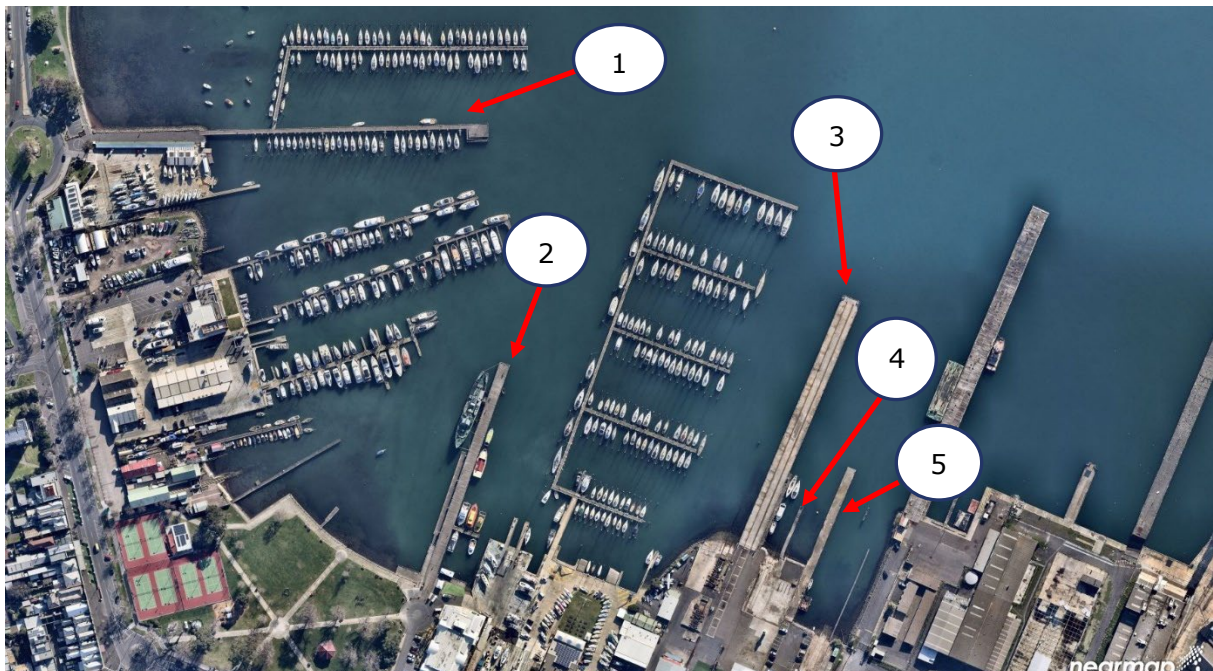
Detailed aerial view showing the five pier/jetty structures at Williamstown with Ferguson Street Pier (1), Gem Pier (2), Workshop Pier (3), Commissioners Jetty (4), and Boyd Street Pier (5) (Source: Nearmap 2022 with GML overlay)
